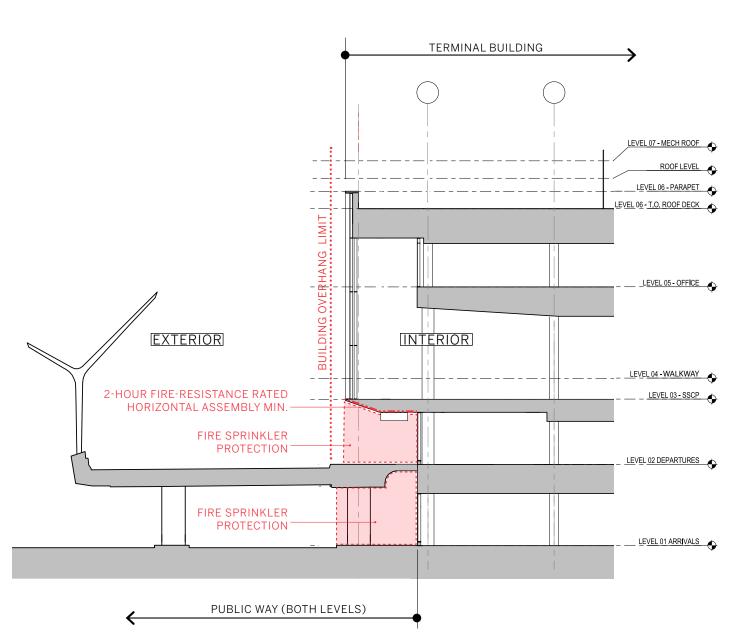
TYPICAL SECTION AT BUILDING CANTILEVER B. The floor of the building overhang will
